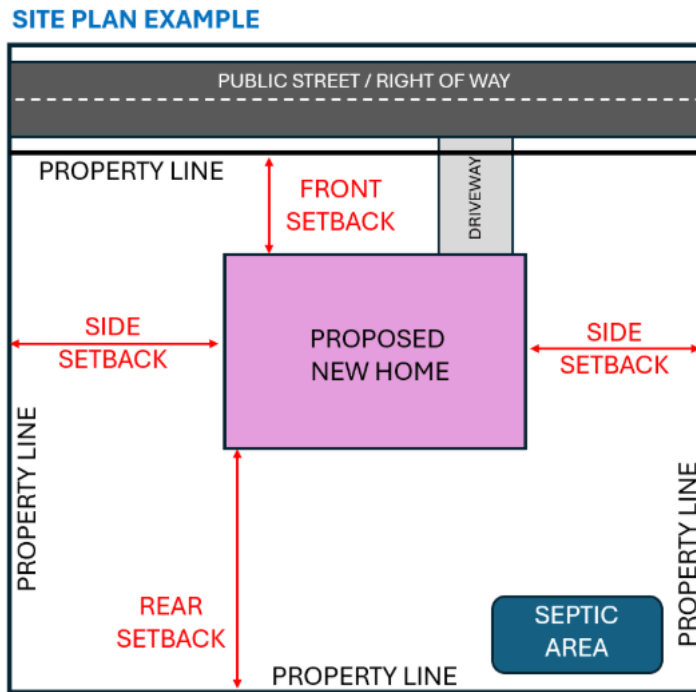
Example site plan with setbacks. Source: [City of Sandord, NC](#).
